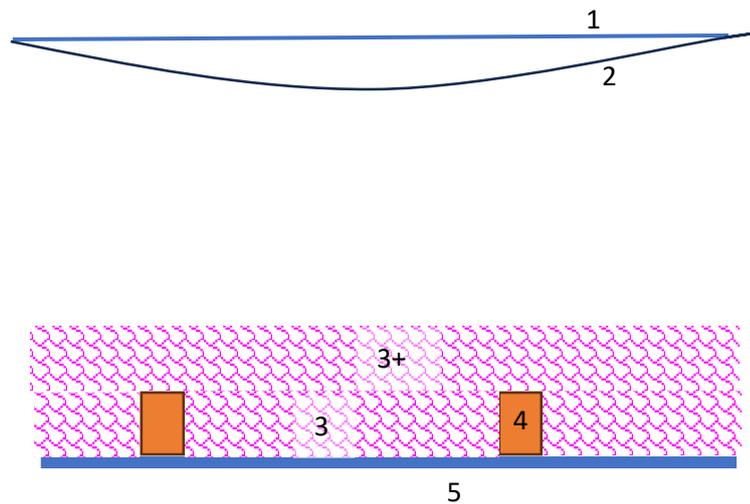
Ceiling insulation schematic – two layer. Key: 1. Metal roof. 2. Reflective sarking. 3. Fibreglass insulation 3+. Additional layer of fibreglass insulation. 4. Ceiling joists. 5. 12mm plasterboard
